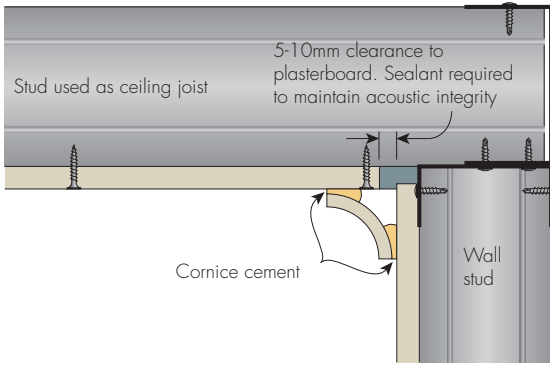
Non-Trafficable Ceiling to Plasterboard Wall
